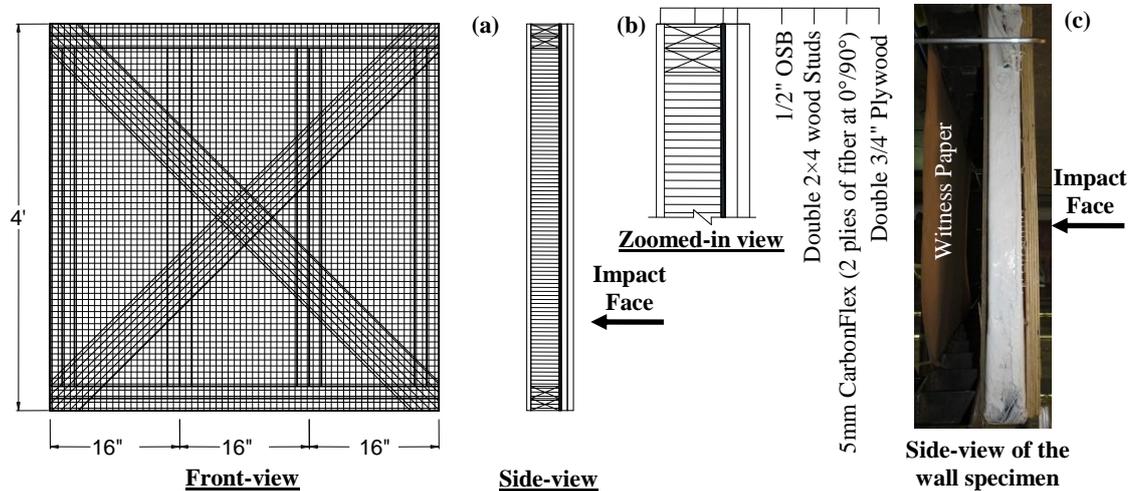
The dimension and detailed layout of the wall panel impact specimens
